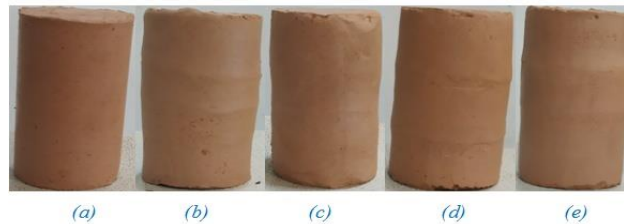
Soil specimen before and after loading with and without geotextile (a) Plane soil specimen before loading (b) Plane soil specimen after loading (c) Soil specimen with one-layer geotextile after loading (d) Soil specimen with two-layer geotextile after loading (e) Soil specimen with three-layer geotextile after loading.
